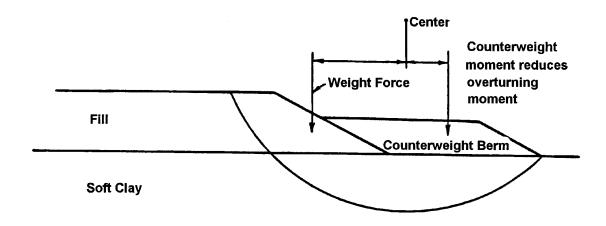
Use of Counterweight Berm to Improve Slope Stability
